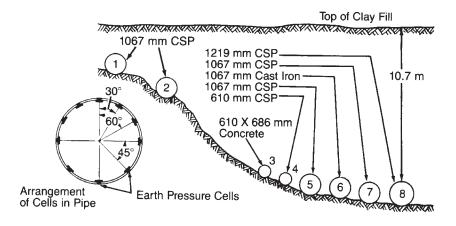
American Railway Engineering Association tests on culvert pipe.
